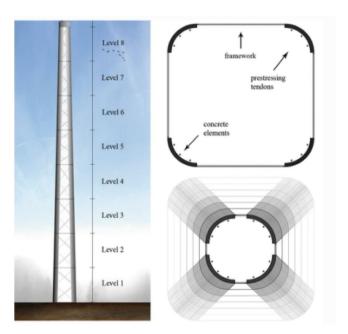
Side-view of the tower (left); lower and upper cross-sections of the tower (right) (Alvarez-Anton et al., 2016).
